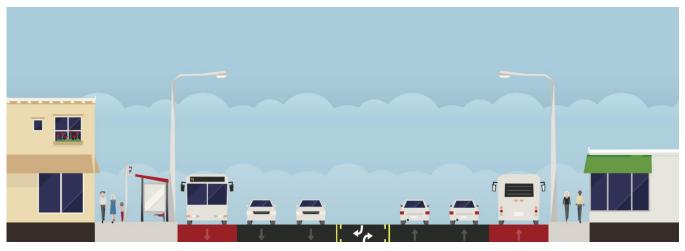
Potential 118 Avenue Cross Section (121a Street to 127 Street)
